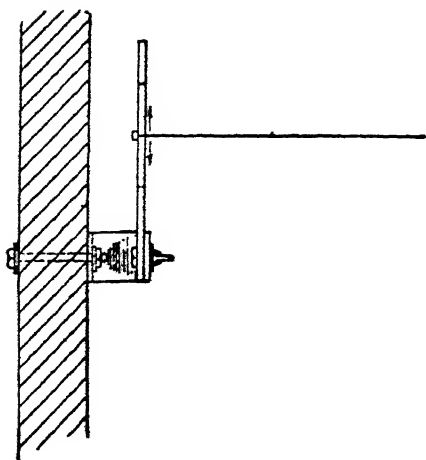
PLAN OF WALL ATTACHMENT, SHOWING LATERAL ADJUSTMENT
